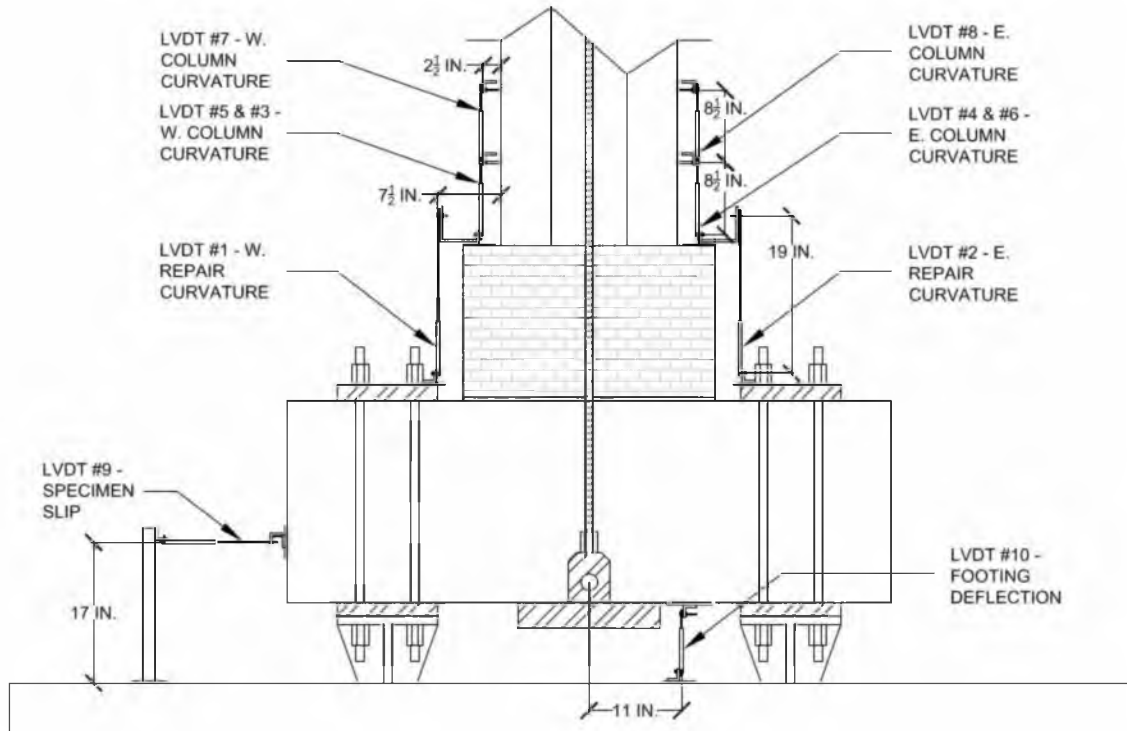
Typical LVDT layout looking north with approximate dimensions
